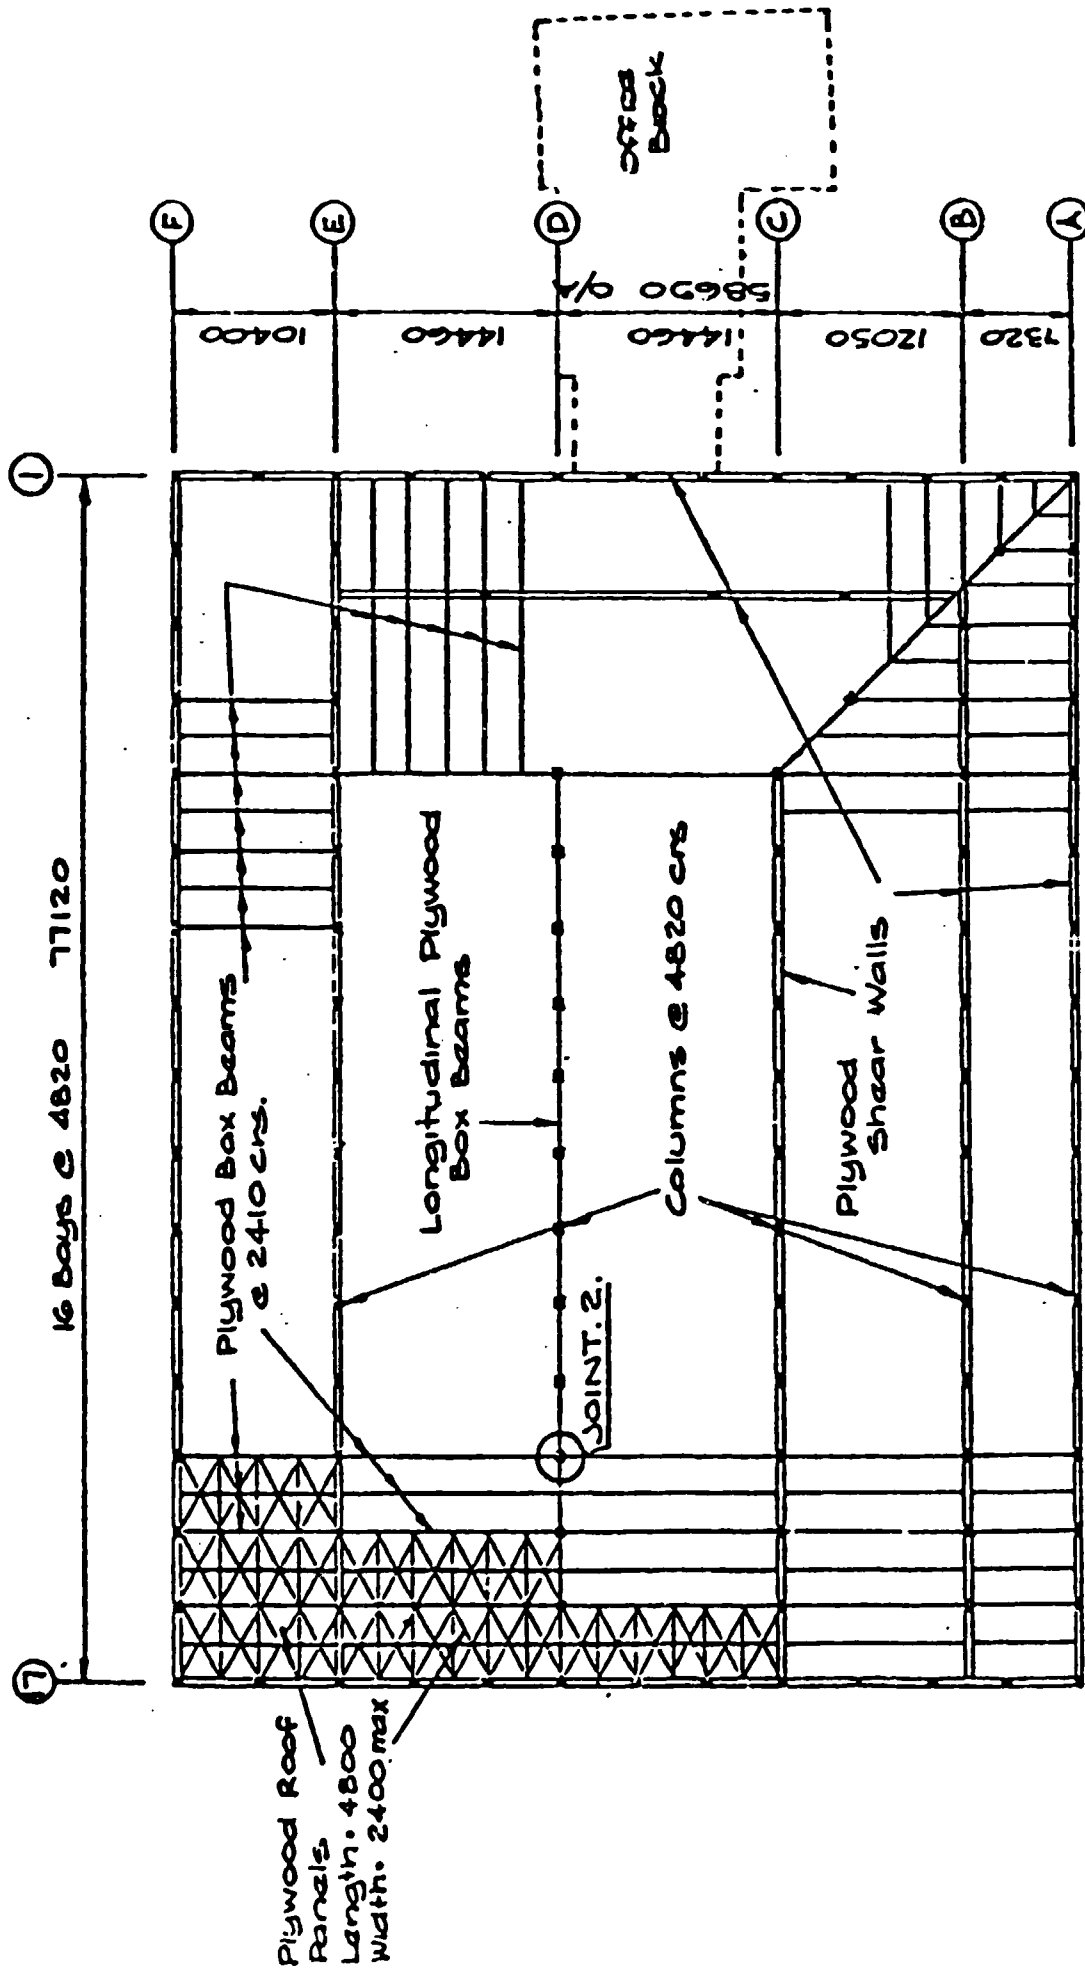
WAREHOUSE STRUCTURAL FRAME - PLAN
